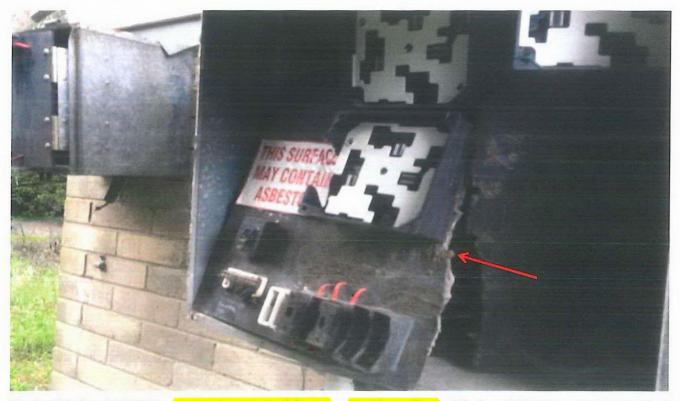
Asset E00017 – Former Lawson Golf Course – Machinery Shed – Western Perimeter – broken electrical backing board containing asbestos.
